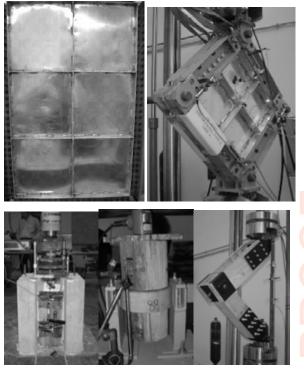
Tests on devices: above left - full bay type, and above right - bracing type pure aluminium shear panels (Naples, Italy); below left - timber-steel-concrete connections in the presence of concrete elements (Lisbon, Portugal), and below middle - in the absence of concrete (Naples, Italy); below right - dissipative beam-to-column wooden connection (Naples, Italy).
